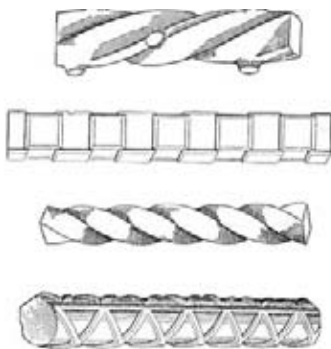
Examples of early steel bars designed to improve the bond between concrete and steel (from Kidder 1909).
